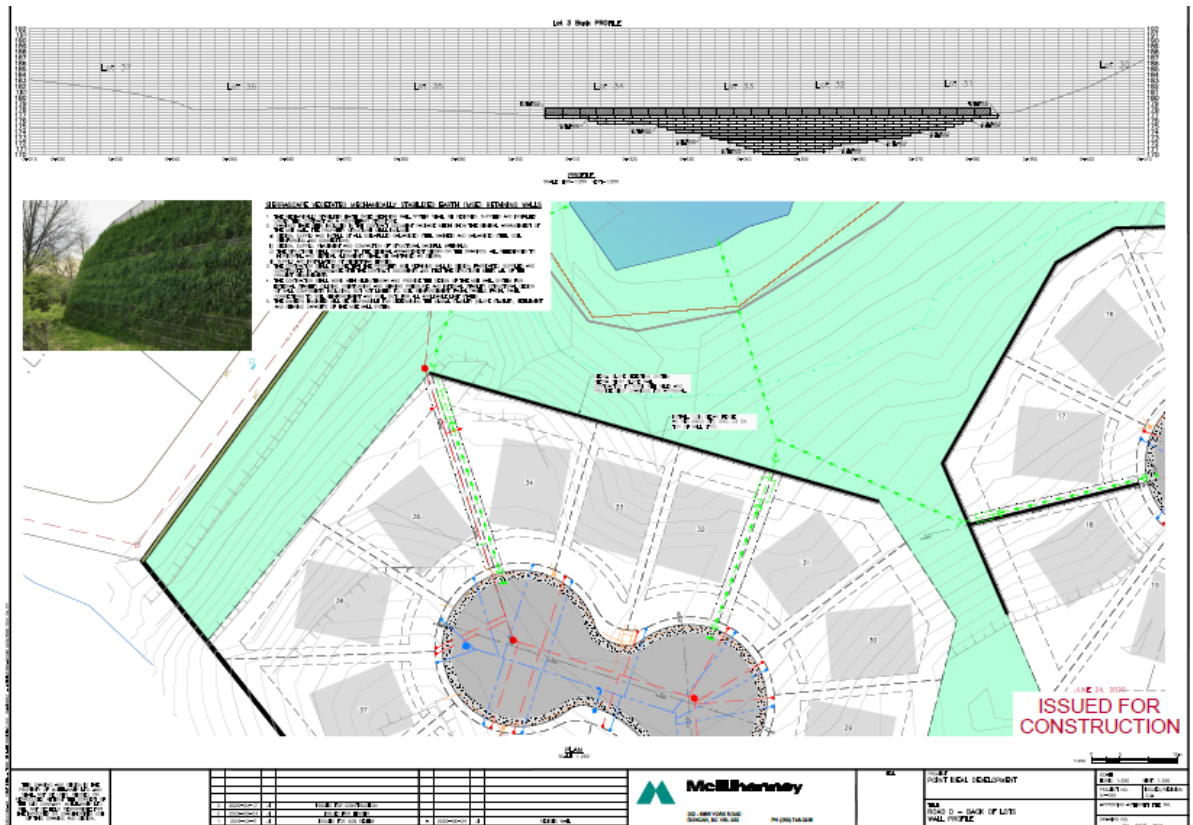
Retaining Wall Profile and Plan for Lots 31-34
